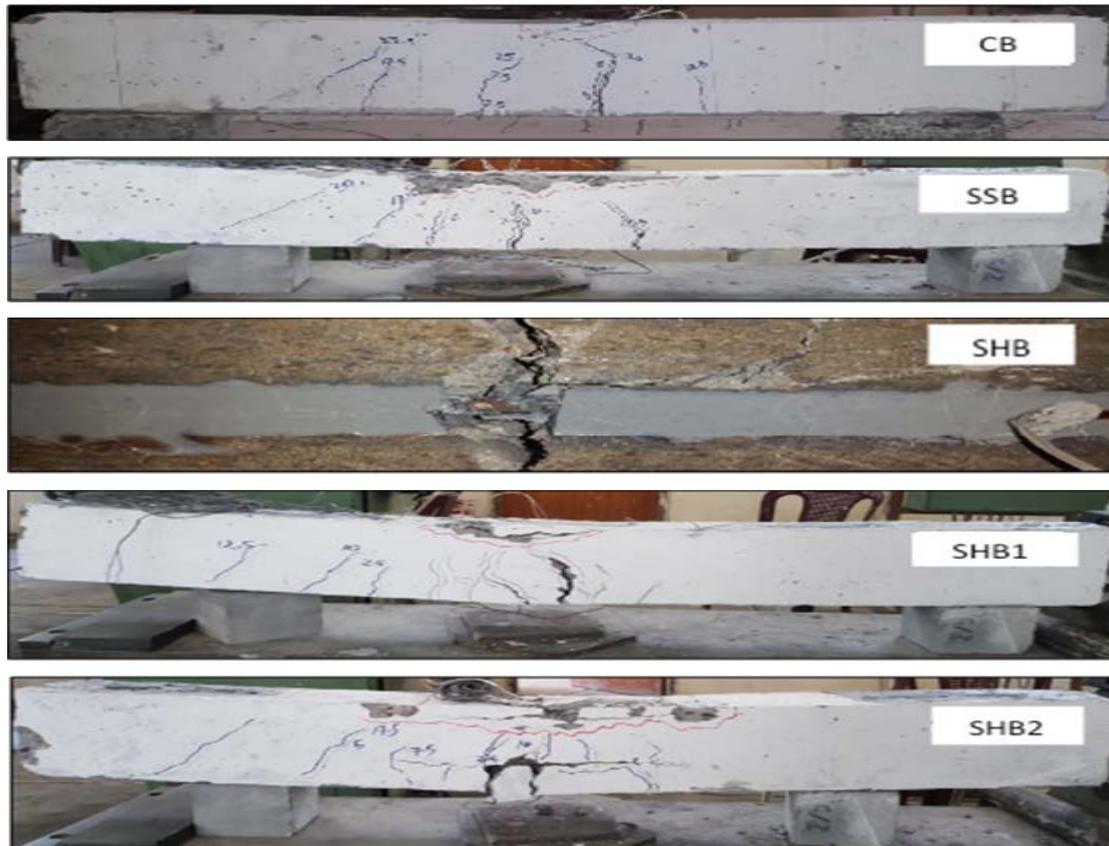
Failure Mode of Tested Beams CB, SSB, SHB, SHB1, SHB2
